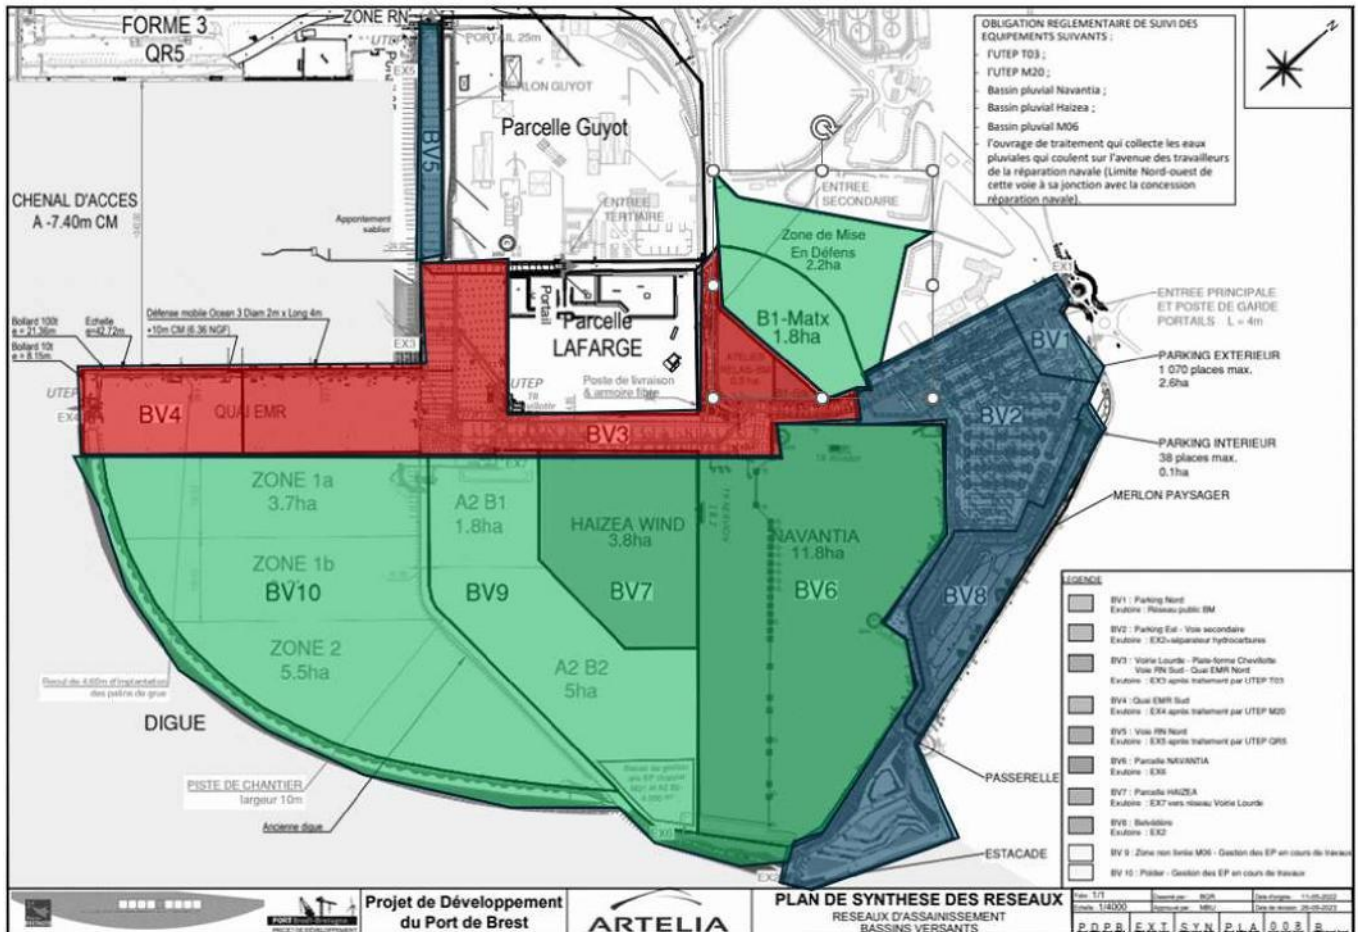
Sewerage networks in the polder (extract from the summary plan of existing networks)
